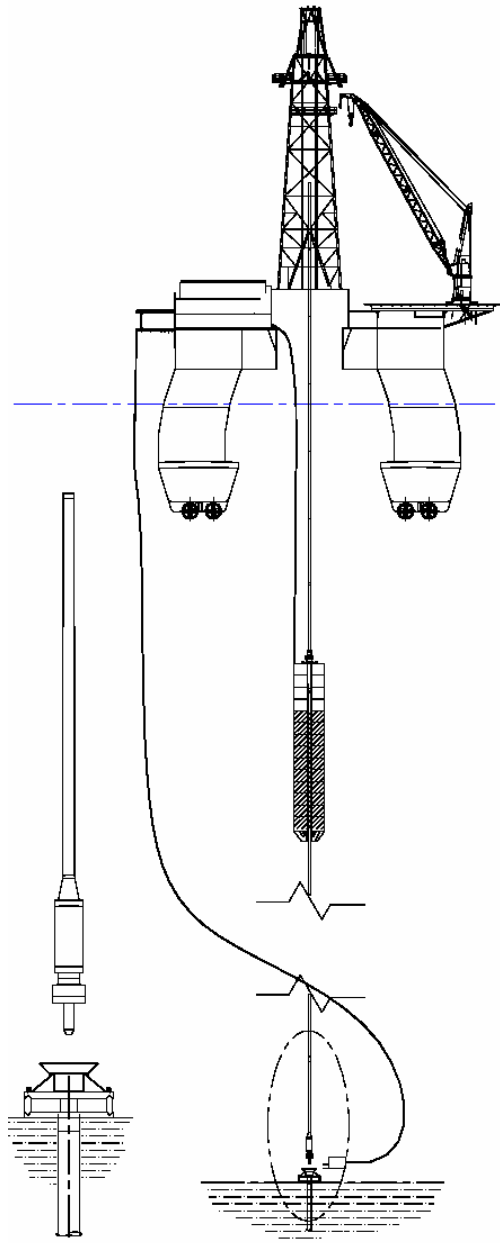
Riser Positioned Above Foundation Prior to Stab-in.
